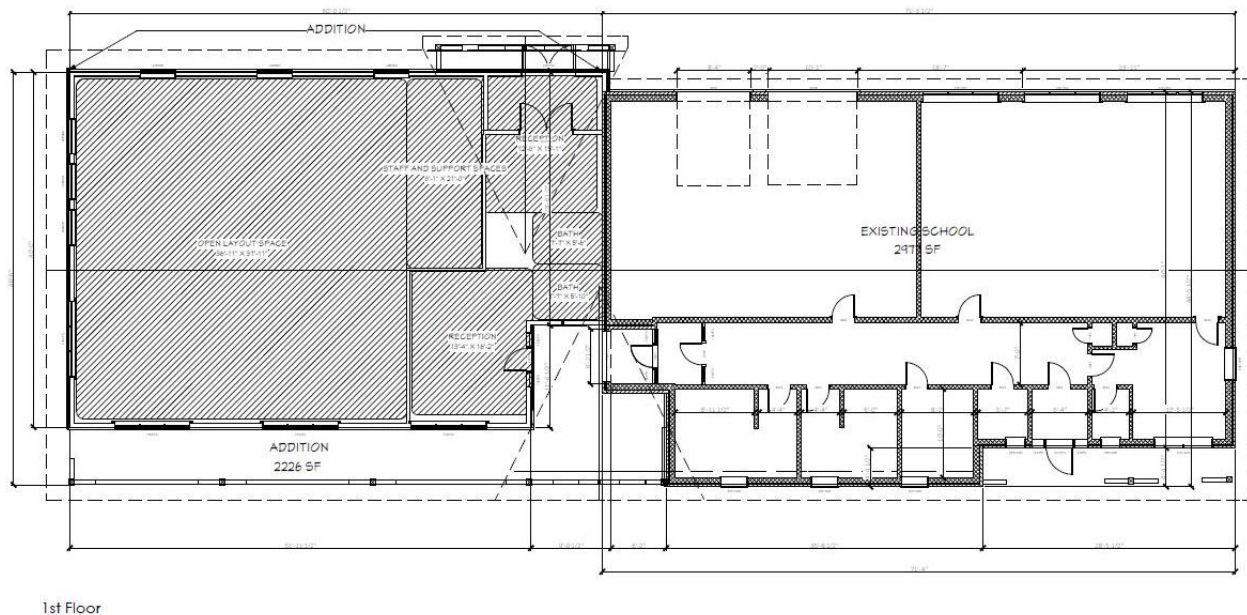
Floor Plans – Office (Source: Wren Design Studio)
